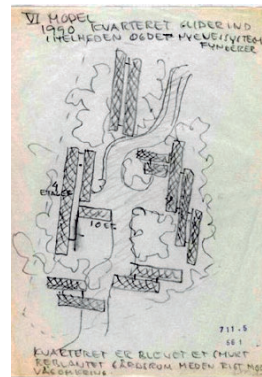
Site Plan of Vestre Vika, Oslo, Norway.
